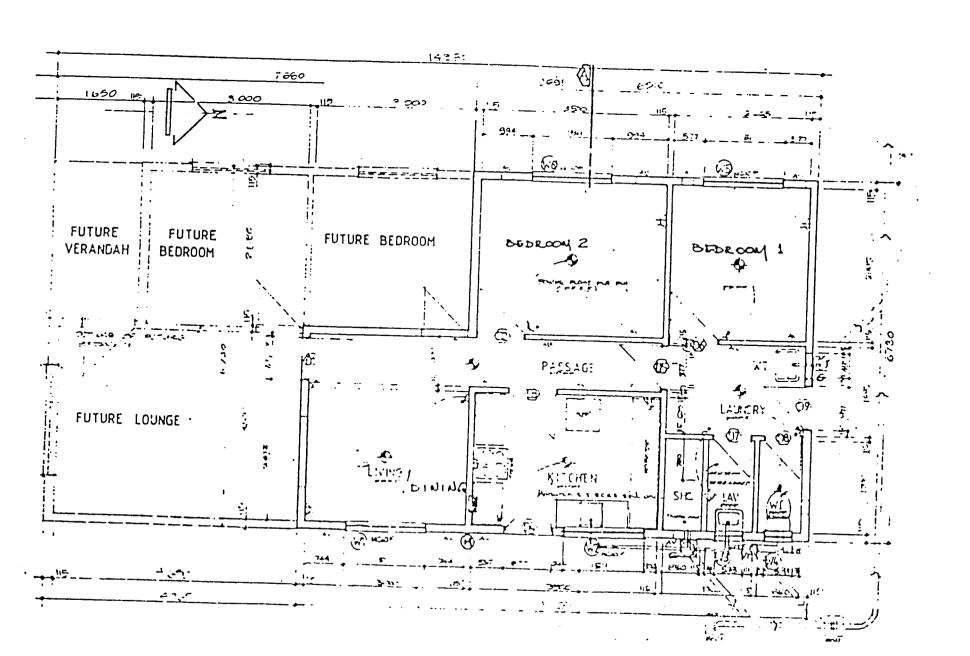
FLOOR PLAN OF POPULAR HOUSE TYPE IN BINDURA
